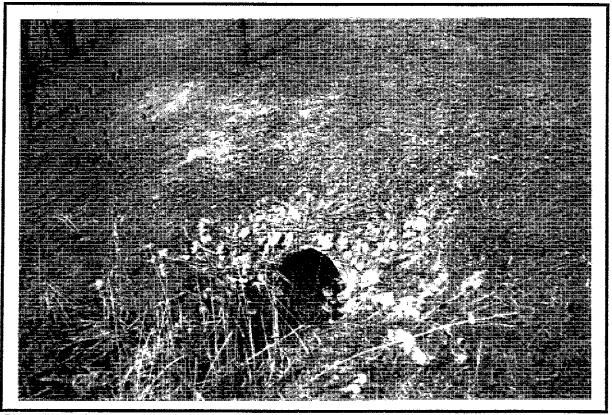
View of the inlet from the North side of Highway 401 and West side of Sixth Line.
